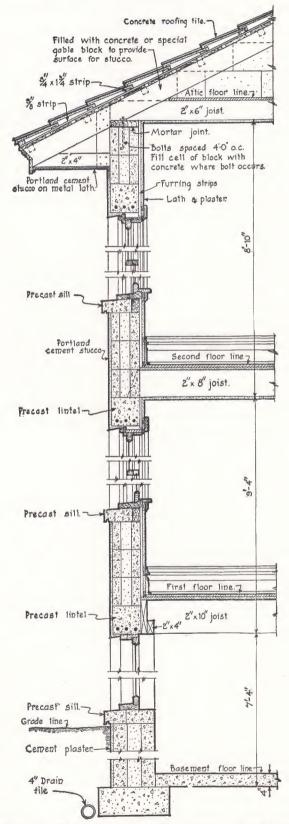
Wall section in concrete masonry showing good practice in the use of Lehigh portland cement concrete products
